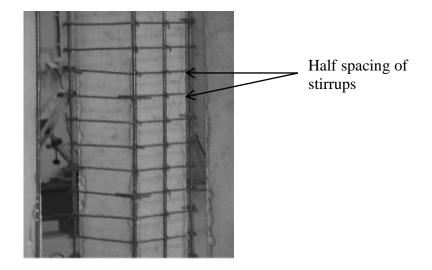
Longitudinal section of column, Julio et al (2003)
